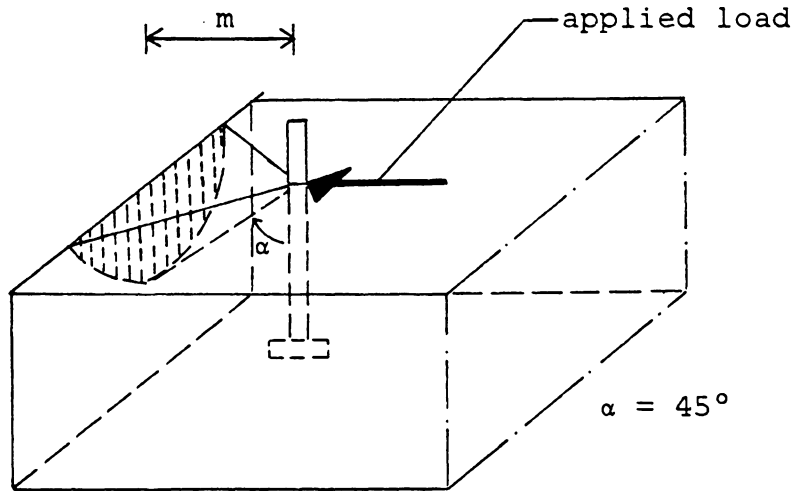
Semiconical Concrete Failure Surface
